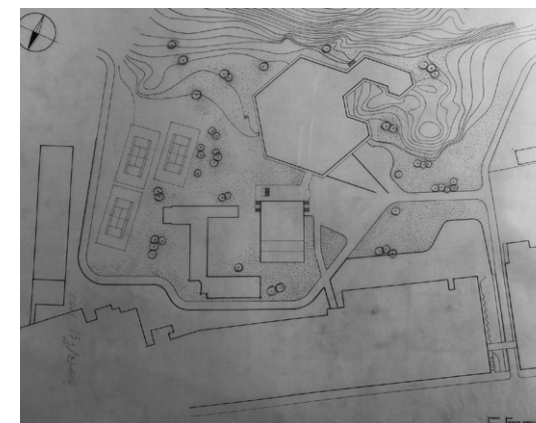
Olivetti Canteen, Ivrea 1953-59, Floor plan of the external layout (OL/M183), July 1959. Gardella Archive, CSAC.
